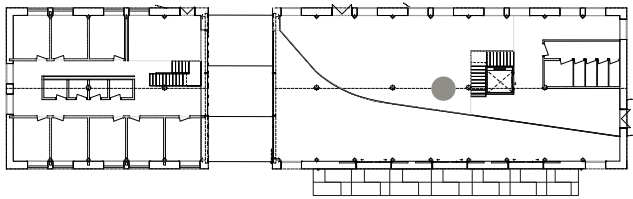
Floor plan: Accommodation Building II & Dinning hall (First Floor)
